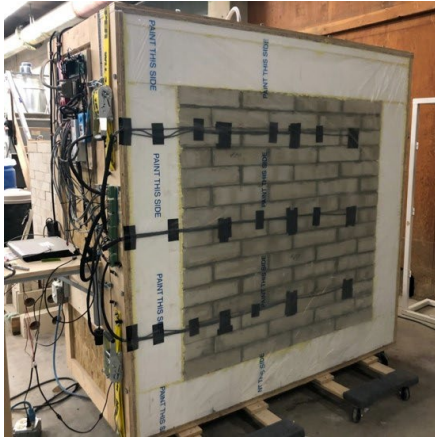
DWB specimen wall prior to testing. Figure 3b: Wall detail. Wall has been instrumented, mounted in frame, and frame is clamped to climatic chamber.
